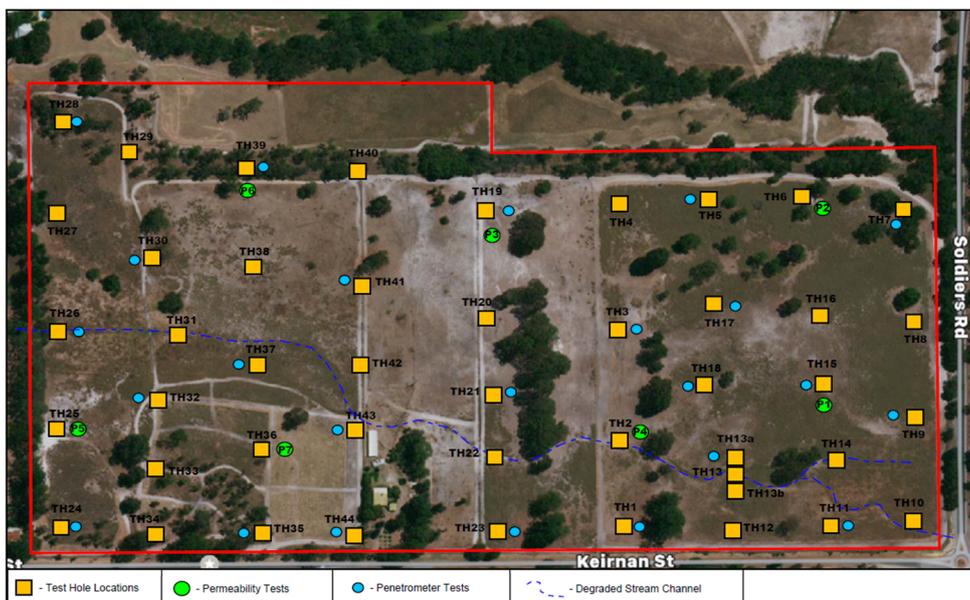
Extract from Test Location Plan, Brown Geotechnical
